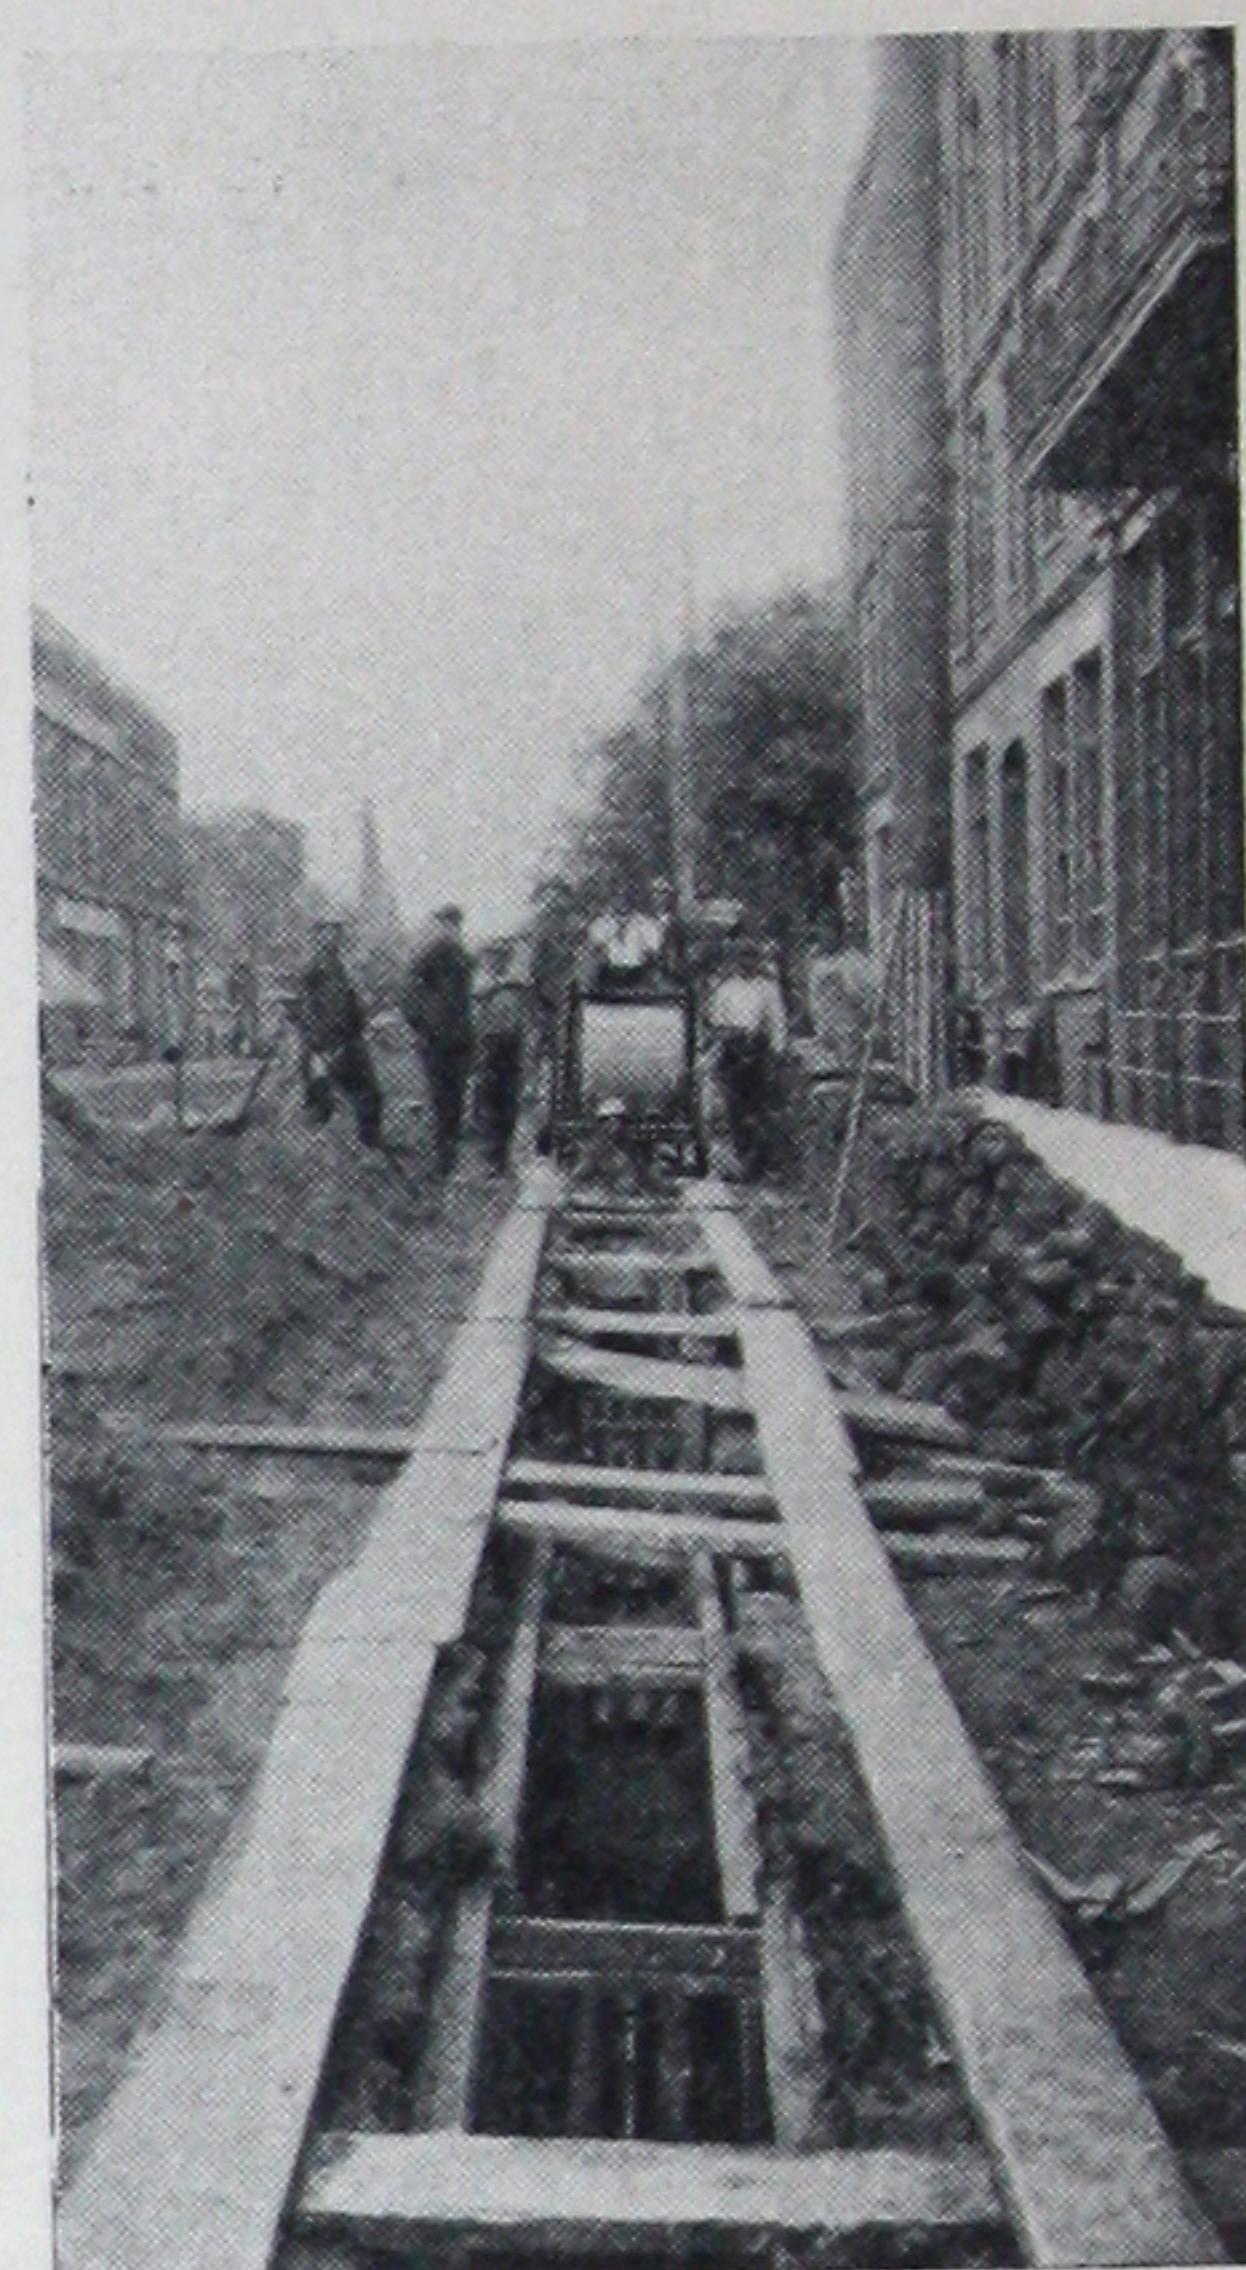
Smith Hand Mixer placed over excavation for telephone underground conduit system. Concrete is discharged directly into the excavation.
